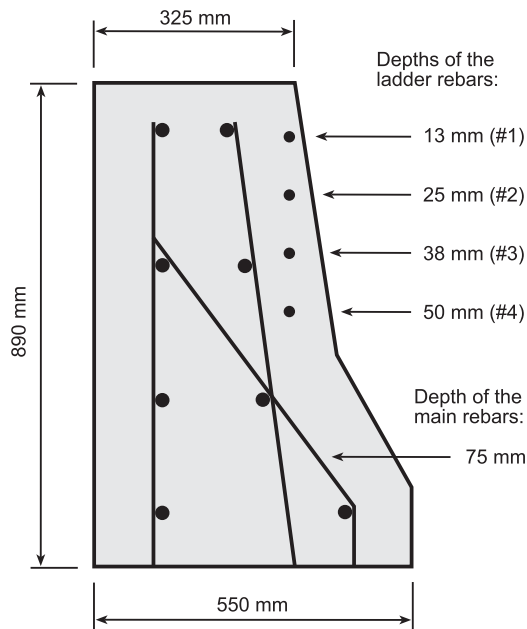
Dimensions and reinforcement details of barrier wall showing main reinforcement with transverse bars spaced at 230 mm, and a test rebar ladder to the right.
